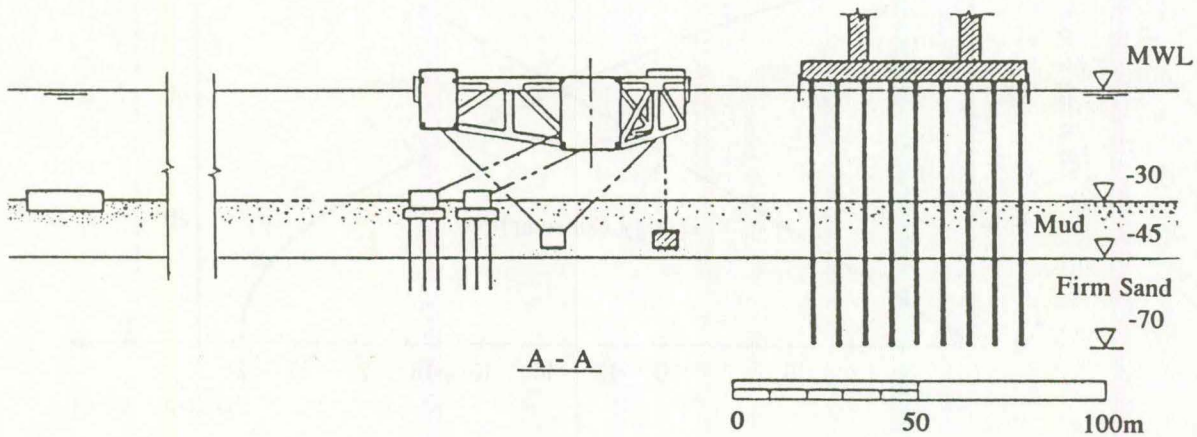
Section of Anchored Pontoon (Floating Buffer) Protection System for the Zarate-Brazo Largo Bridge [32]. (All Units are Metric)
